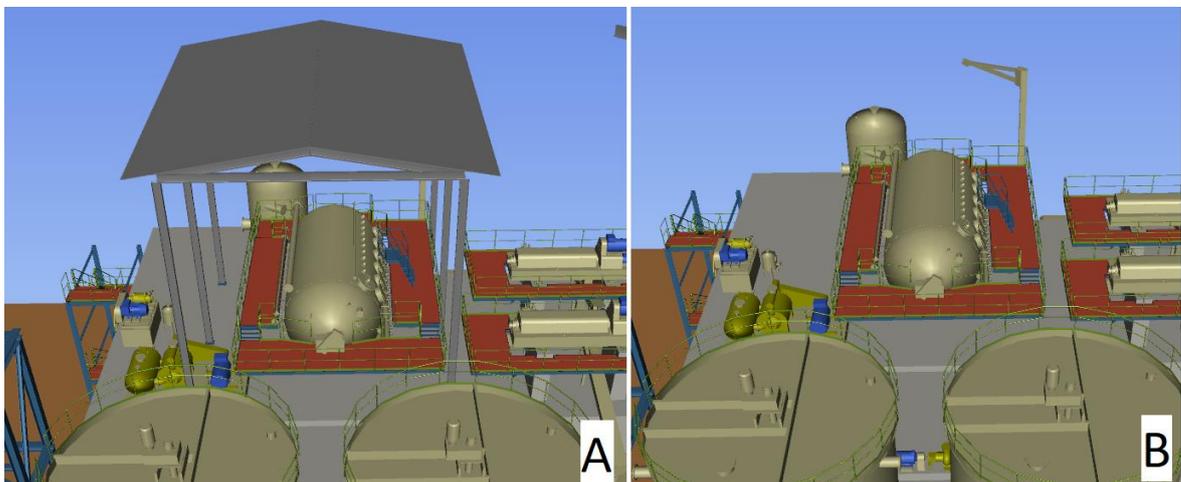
Equipment with additional rooftop (A) and without rooftop (B)
